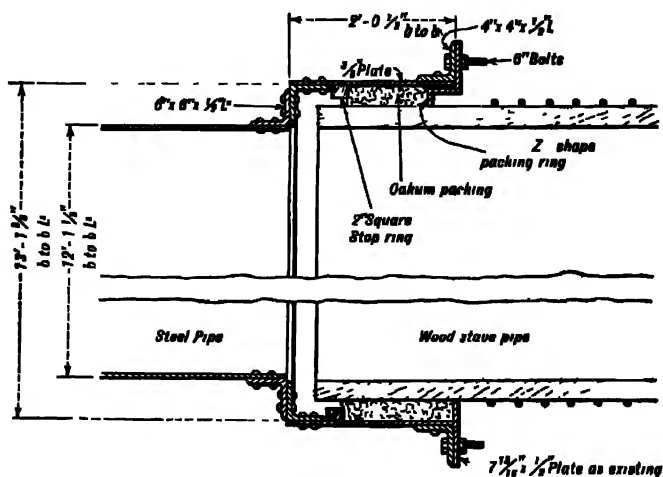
Detail of Trenton Falls expansion joint at junction of steel and wood-stave pipelines. (Central New York Power Corporation)
